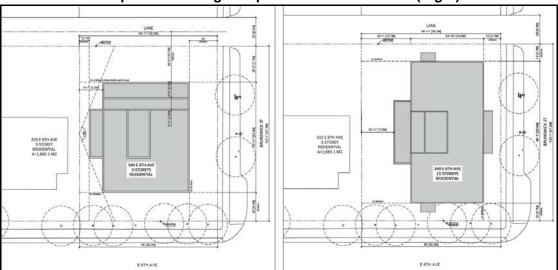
Typical RM-4 Building Footprint with 7 ft. setback (Left); Proposed Building Footprint with 35 ft. setback (Right)
